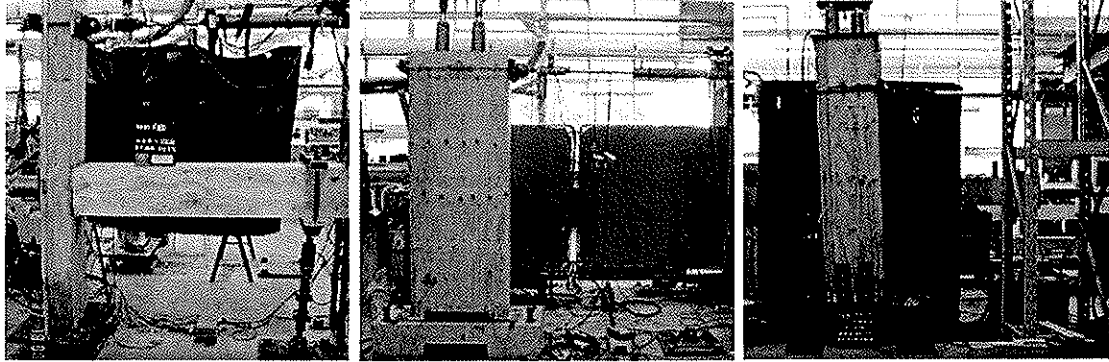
Test set-up of Exterior beam-column, wall-to-foundation, column-to-foundation specimens.
